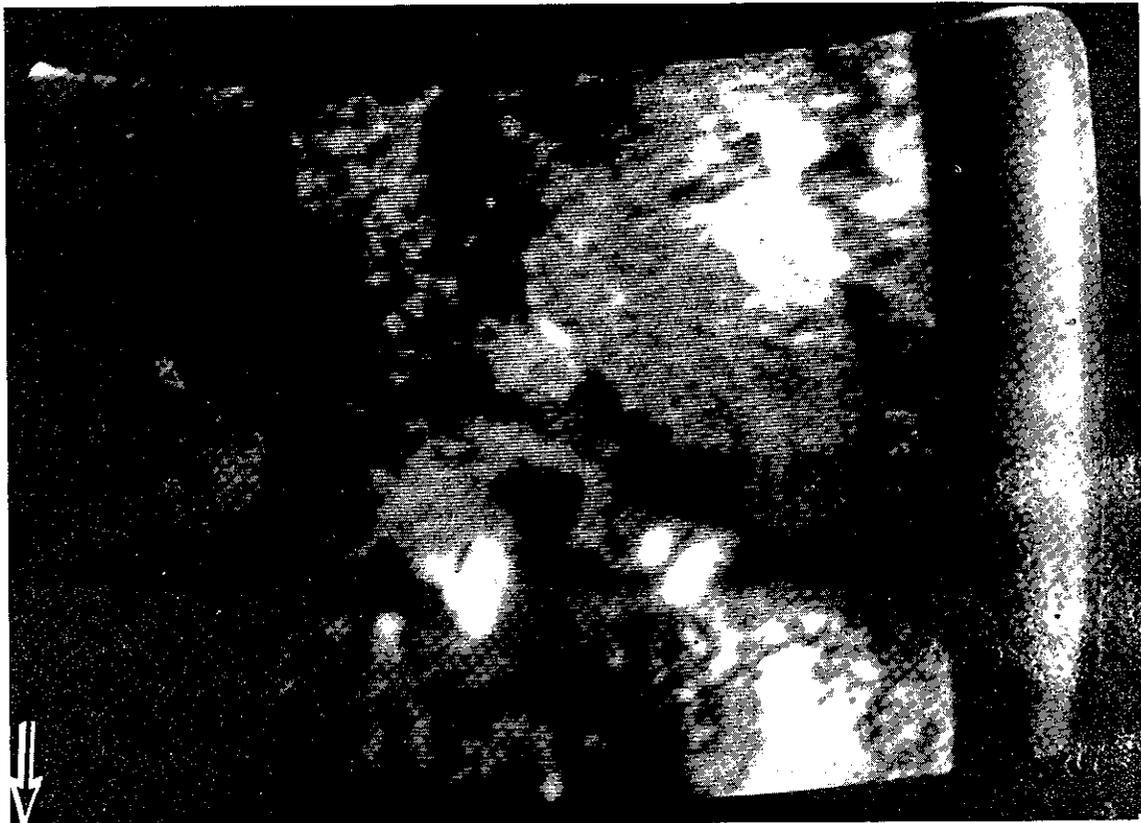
Boring R-4 Anderson Grade 34.2 ft. Large open fractures in greenstone.
